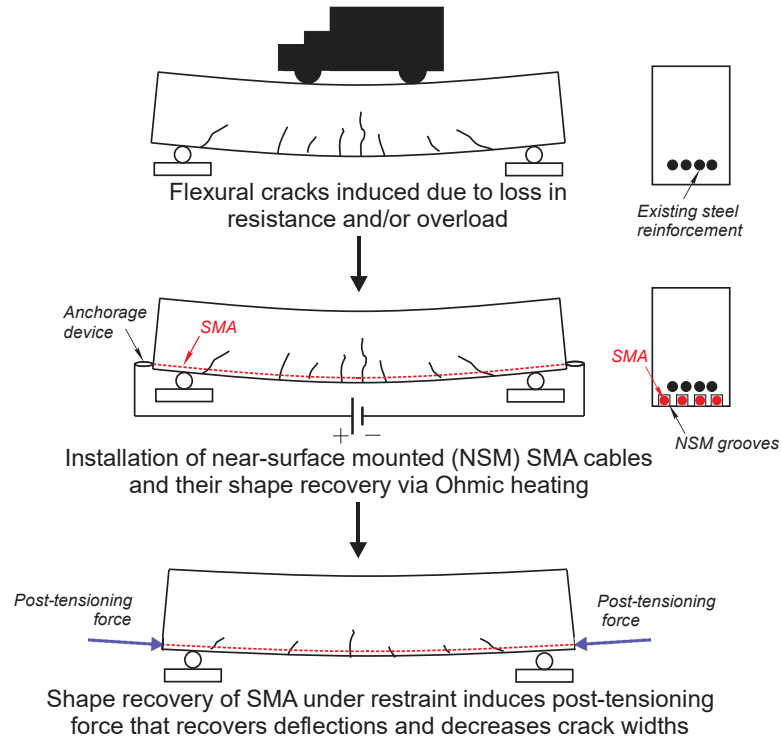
Concept of reinforced concrete girder post-tensioning with NSM NiTiNb.
